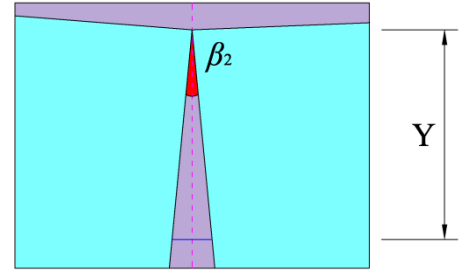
Rebar extension in yield-line intersection crack  $\beta_3$
